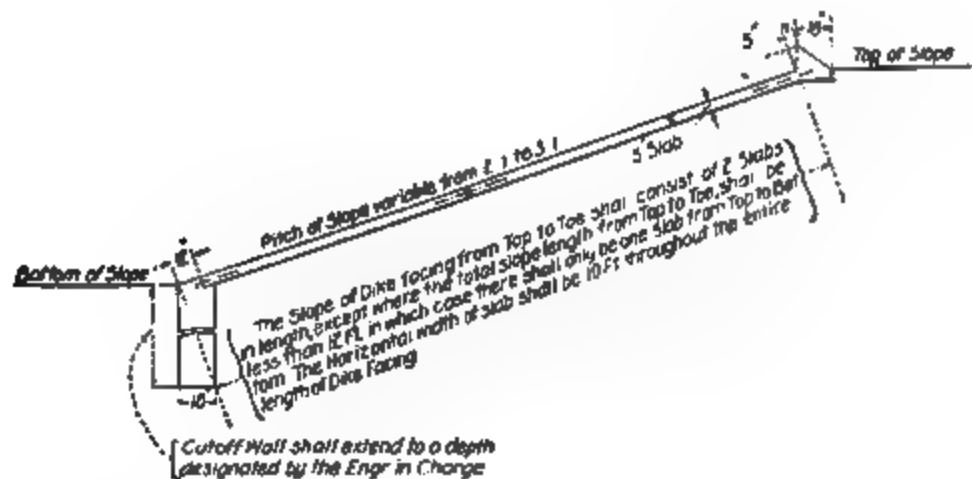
Concrete lining for east dike of reservoir No. 1, North Laramie Land Co.
